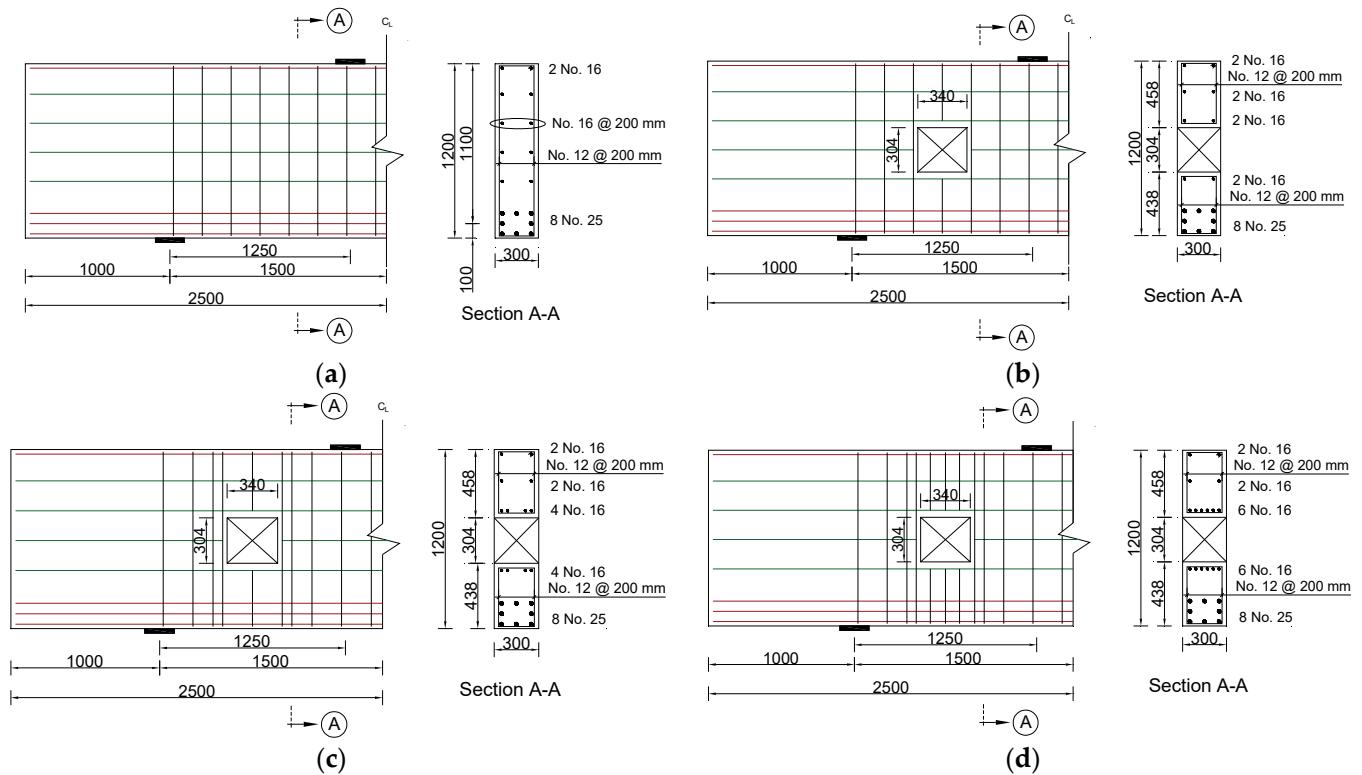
Details of the deep beam models, noting that bars with red, green, and black colors represent the main flexural reinforcement, the horizontal web reinforcement, and the vertical web reinforcement, respectively (dimensions are in mm): (a) DB-S; (b) DB-O1; (c) DB-O2; (d) DB-O3.
